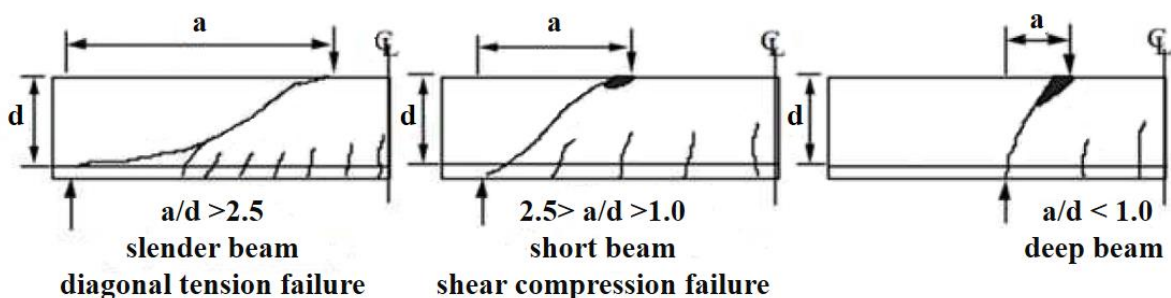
Typical forms of failure on traditional reinforced concrete beams according to review of U.Farooq et al [19].
